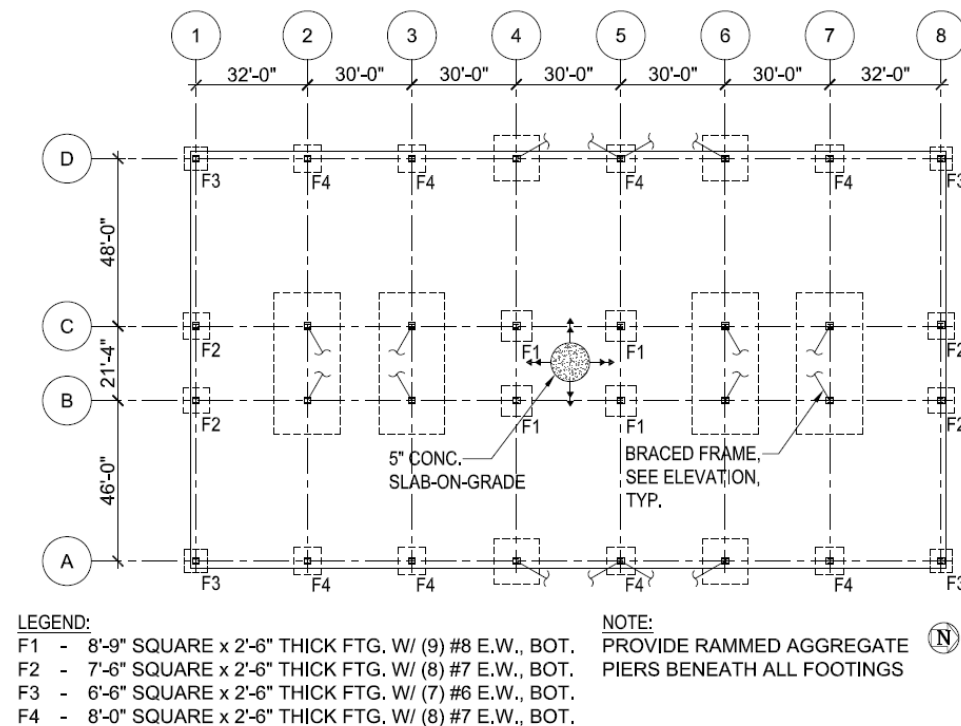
Office building foundation plan showing brace layout for current national seismic code design.
